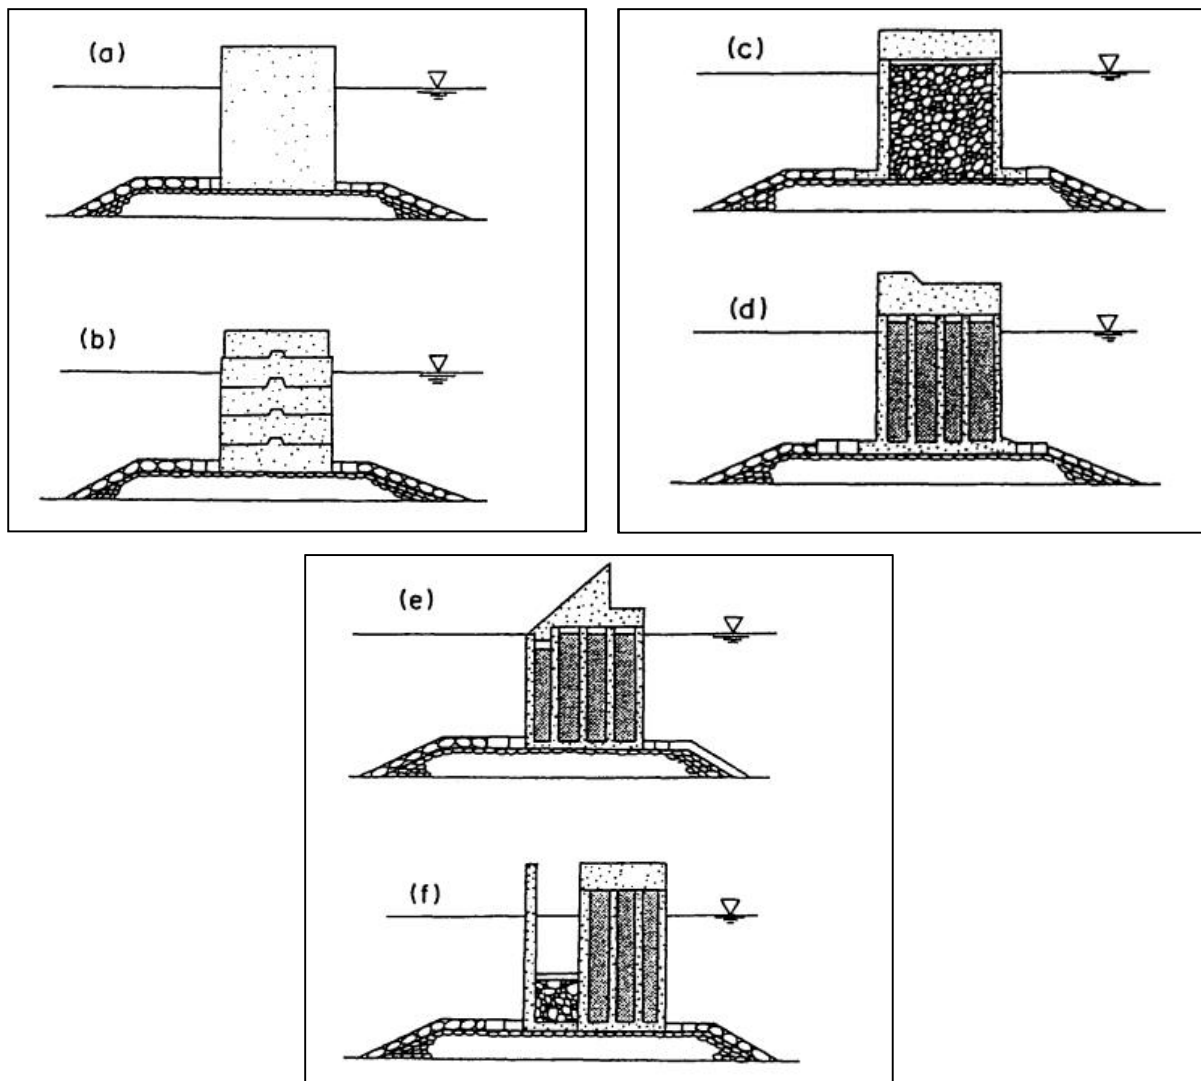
Composite breakwaters: (a) monolith concrete block; (b) block masonry; (c) cellular block; (d) upright caisson; (e) sloping top caisson; (t) perforated wall caisson.
